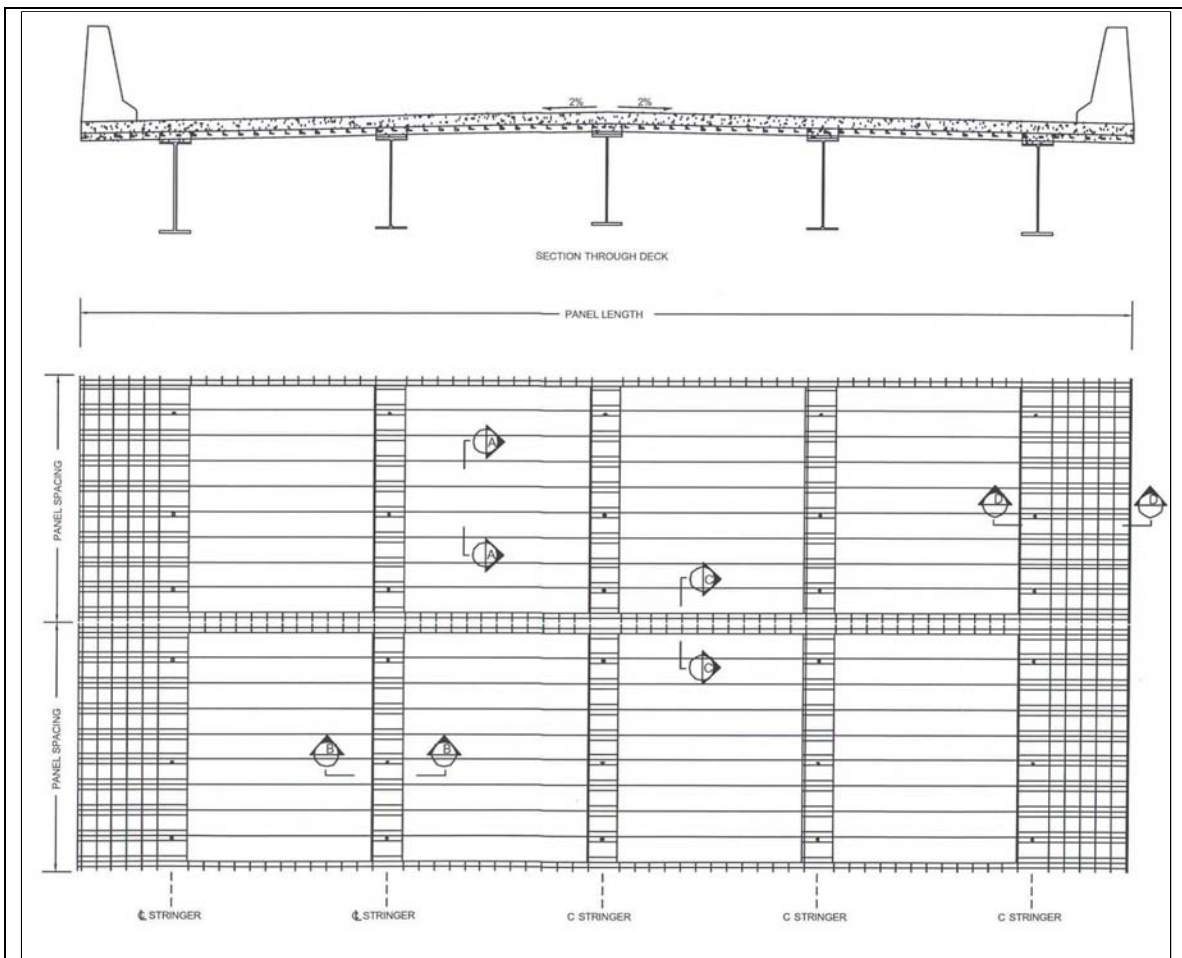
Crowned bridge plan and section (Exodermic Bridge Deck, Inc., 2003)
